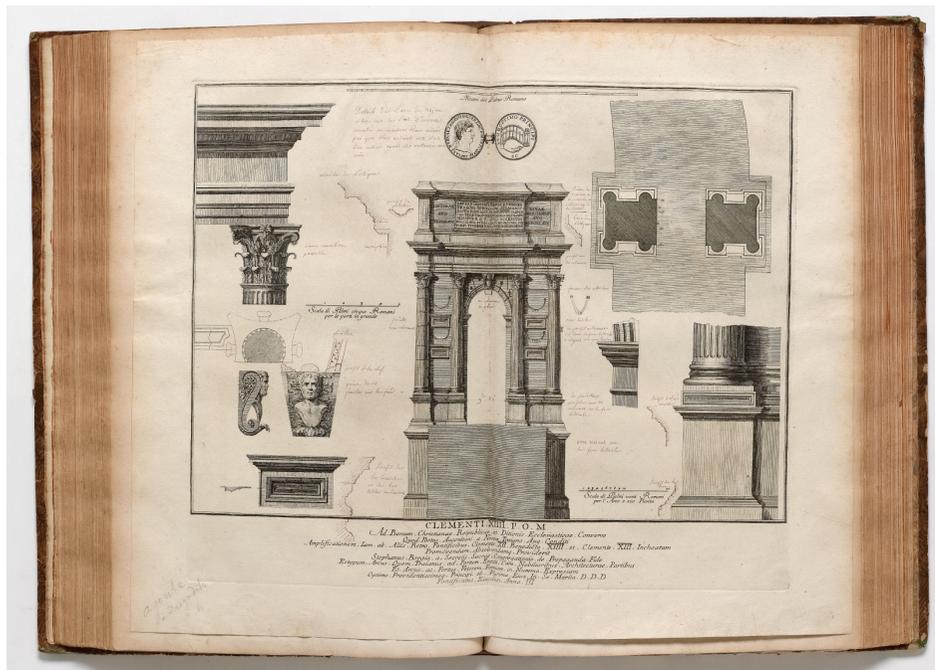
Extra illustration: Elevation and details of Trajan's Arch at Ancona
